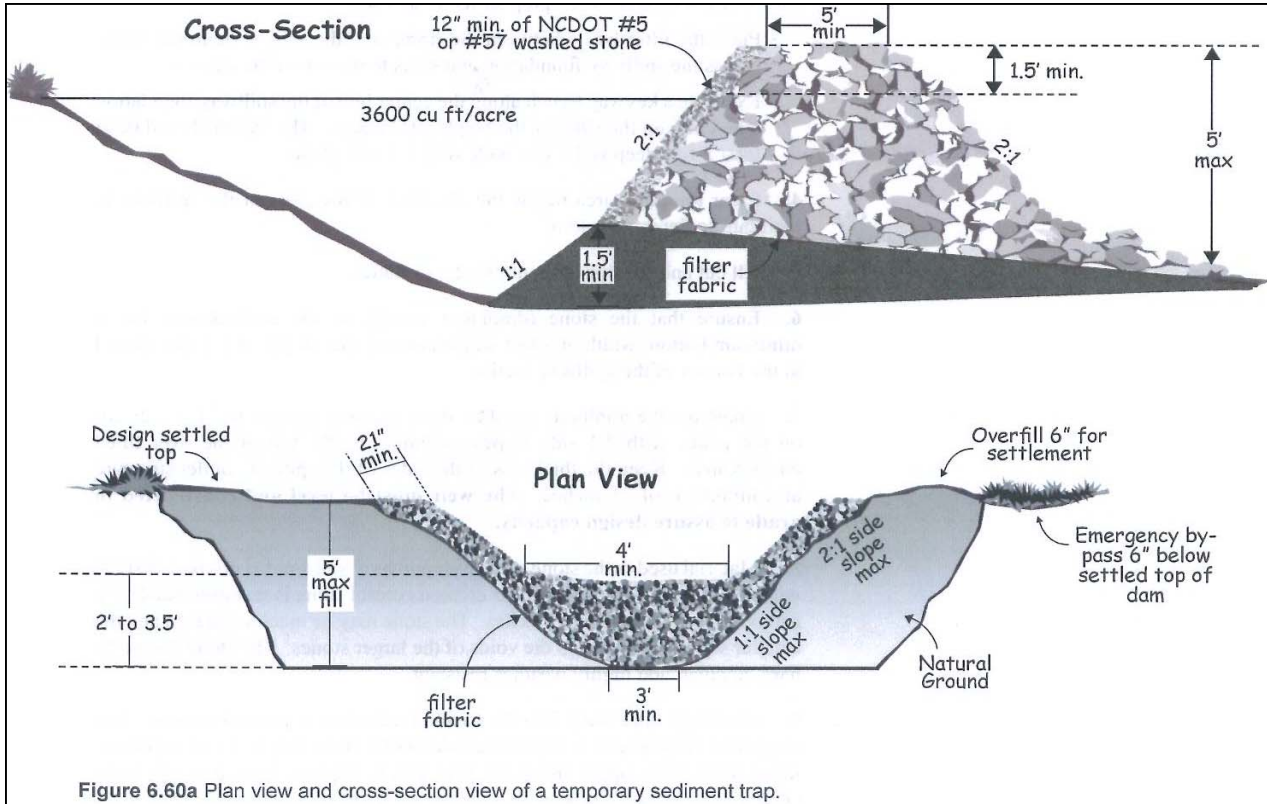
Plan view and cross-section view of a temporary sediment trap.
